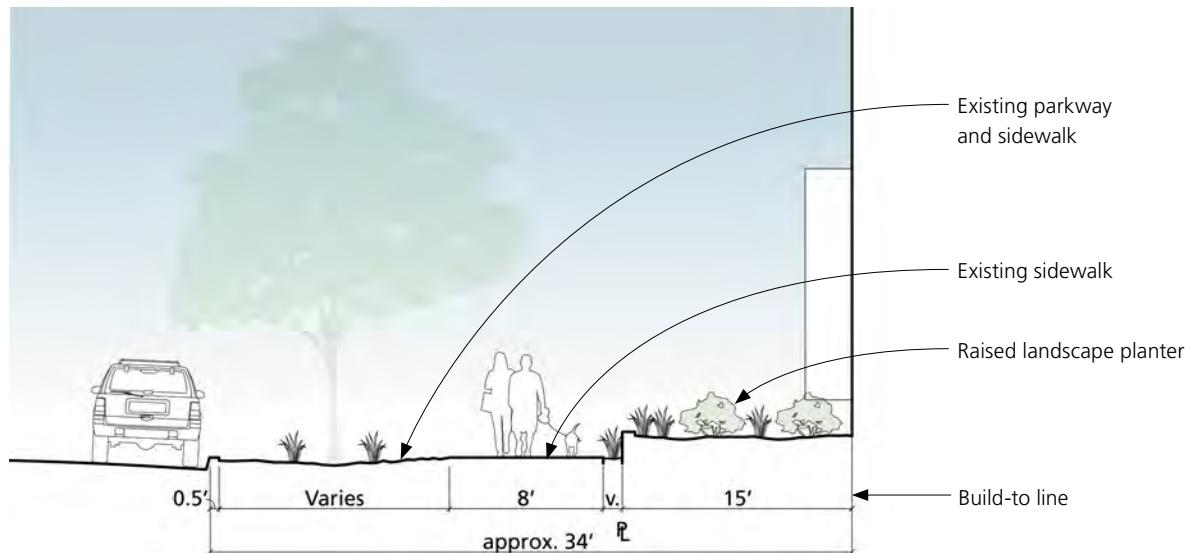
92nd Avenue Sidewalk Section With Raised Landscape Planter
